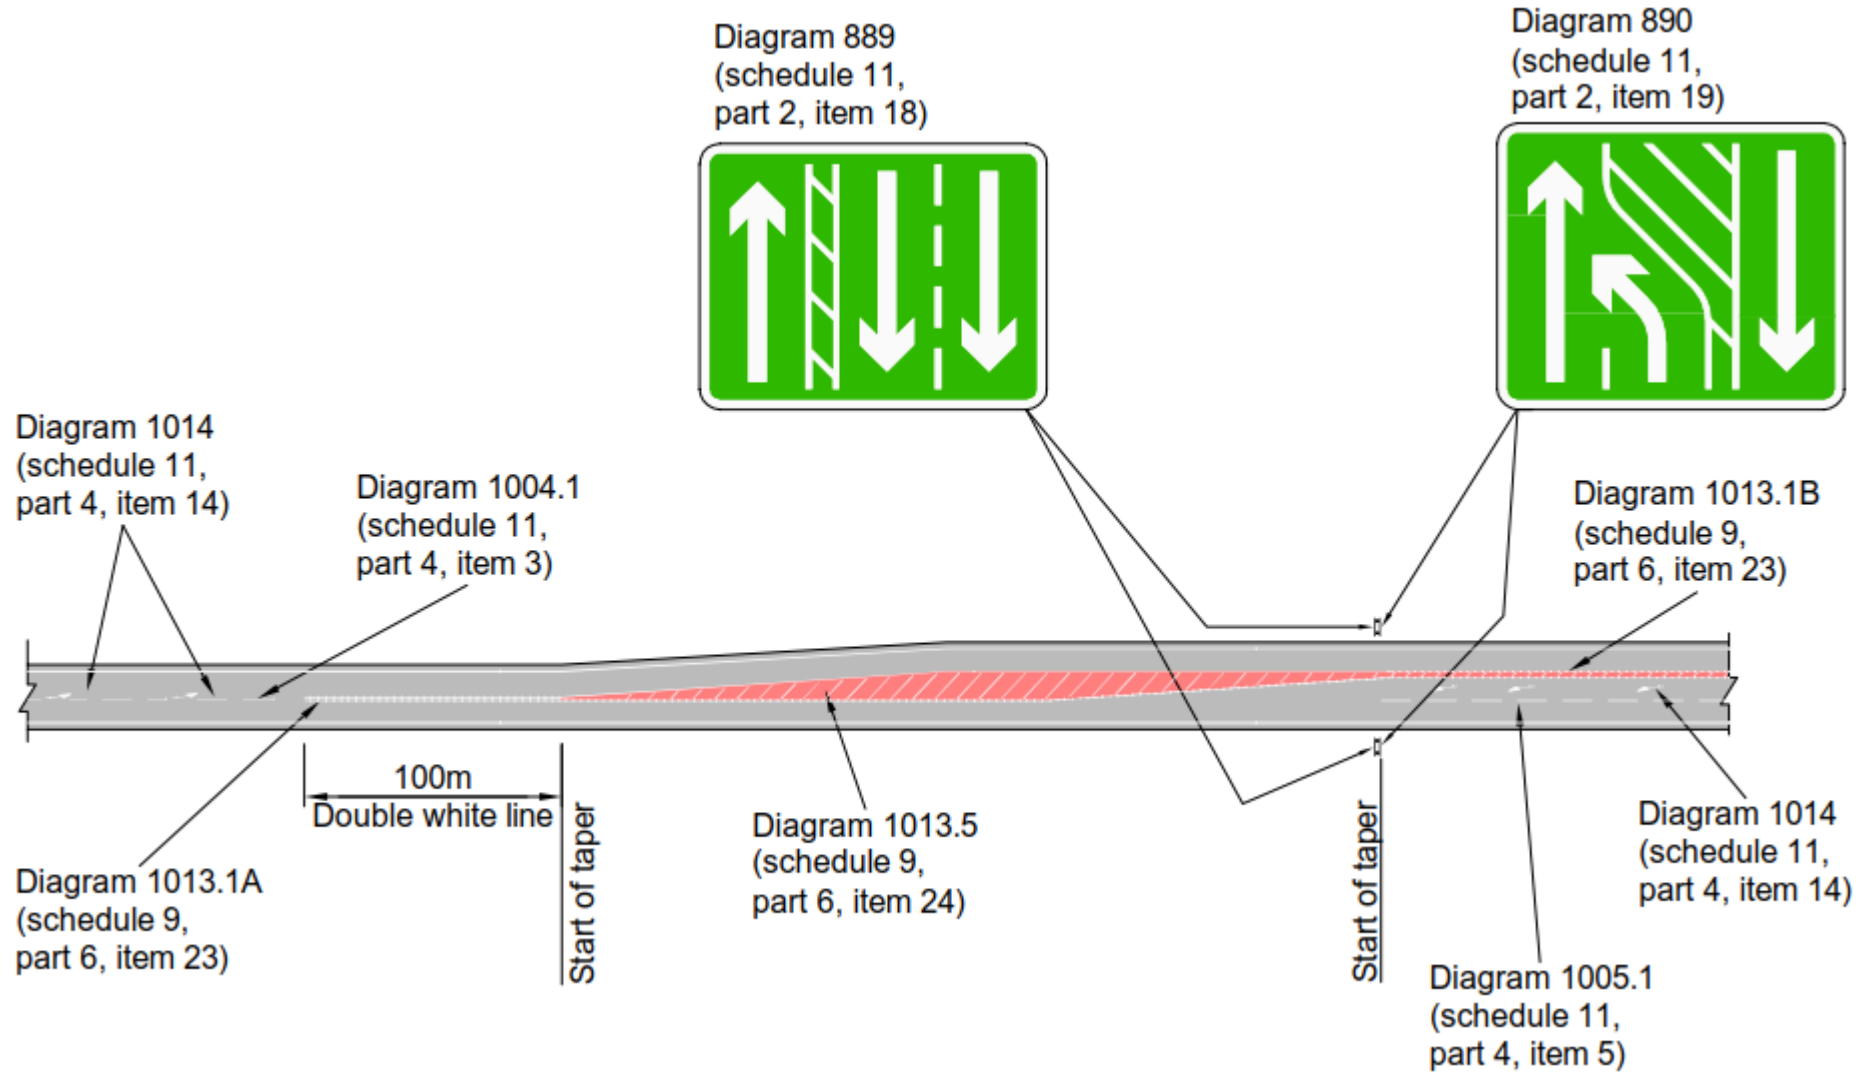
Traffic signs and road markings at WS2+1 interface (commencing on overtaking lane section)
